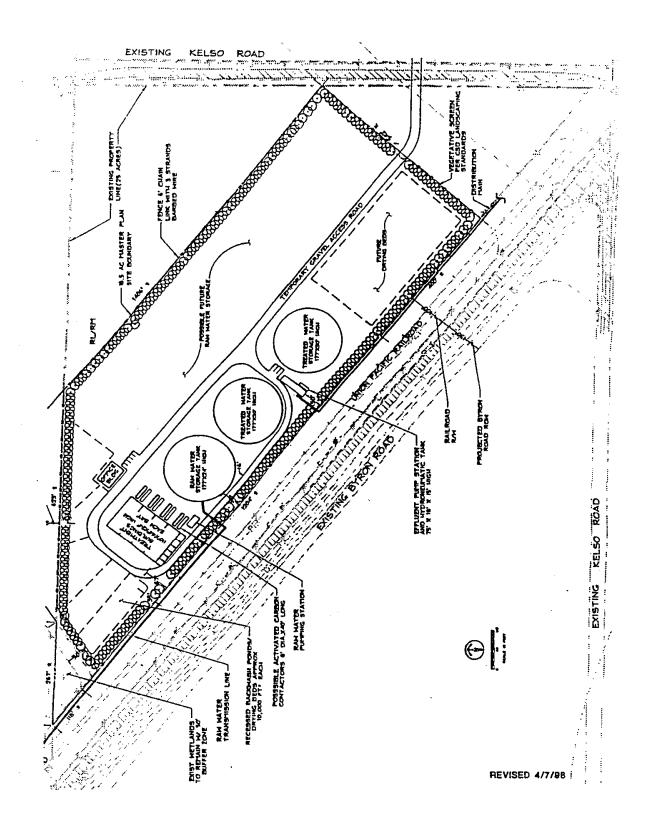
WATER TREATMEMENT PLANT SITE LAYOUT
